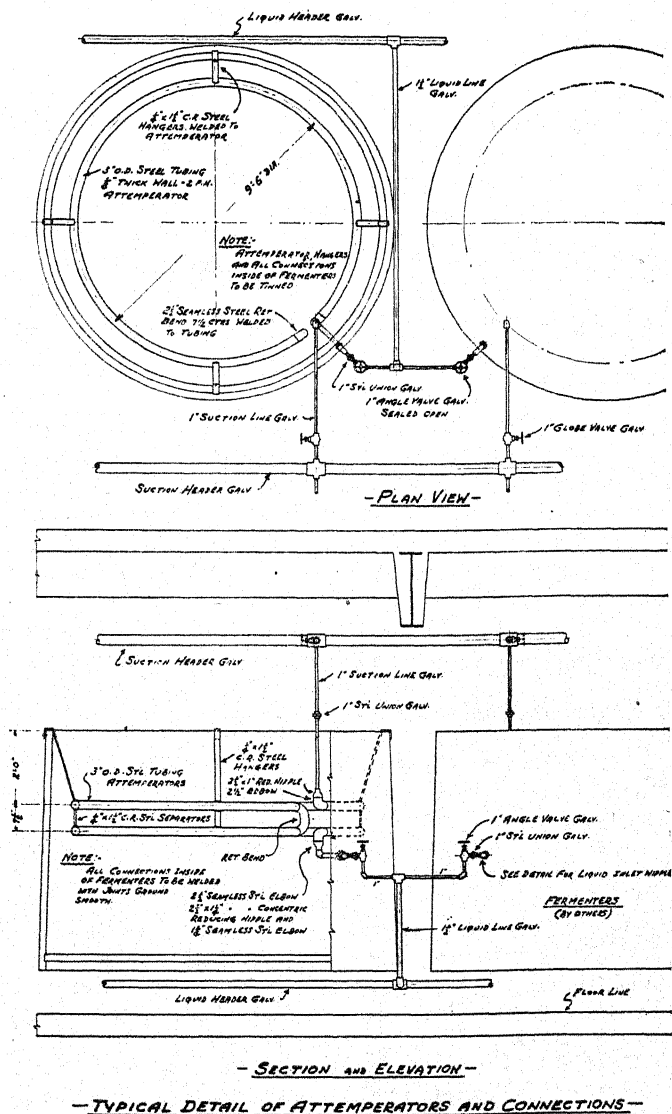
Piping arrangements of flooded system. See also page 947a.
